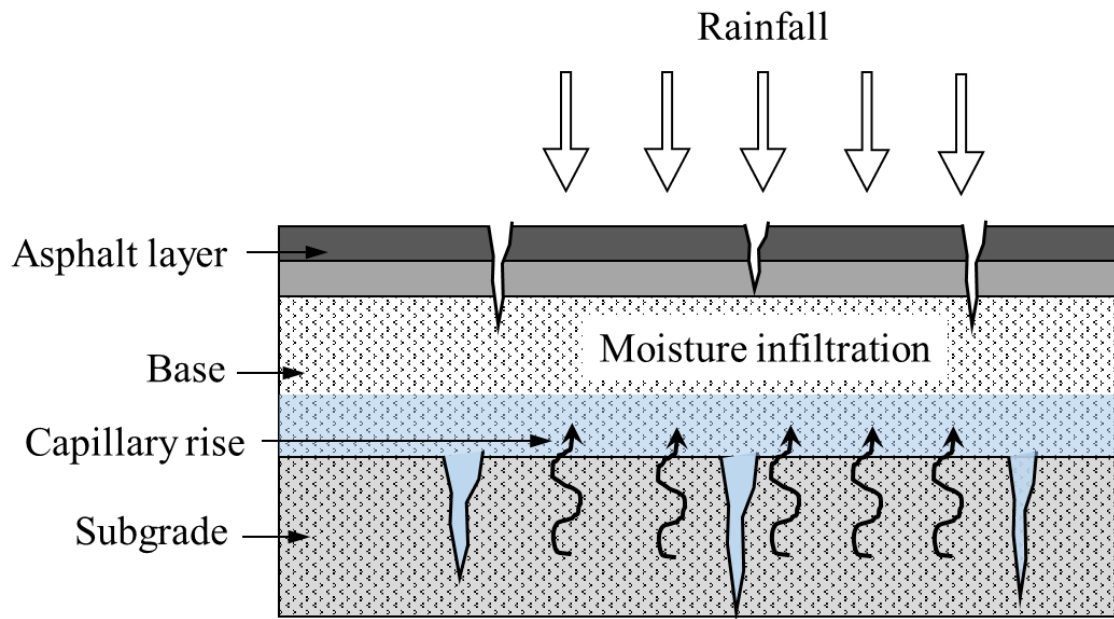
7 Failure in pavements due to cracking of subgrade
